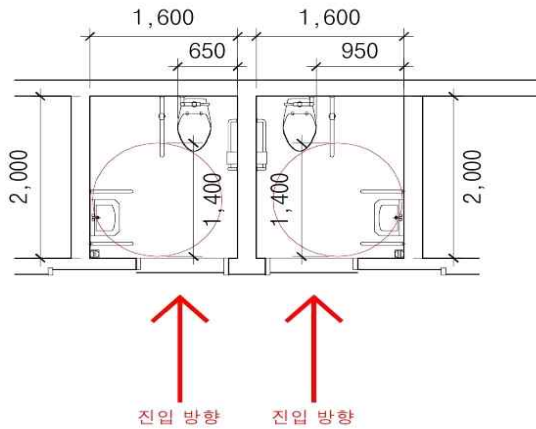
wheelchair user's approach way by layout of lateral direction door to toilet
